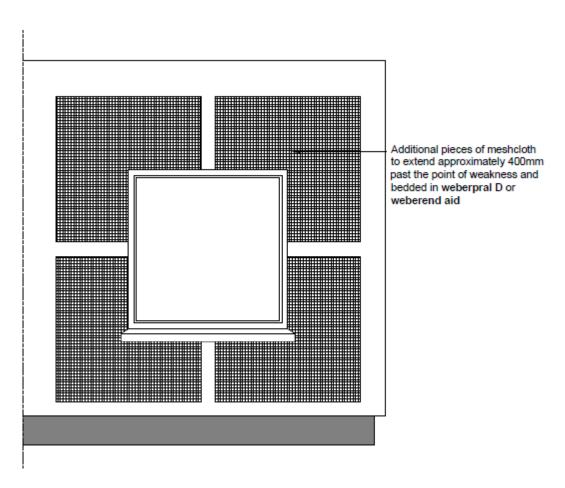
Installation of reinforcement mesh around openings where specified by the render design.
